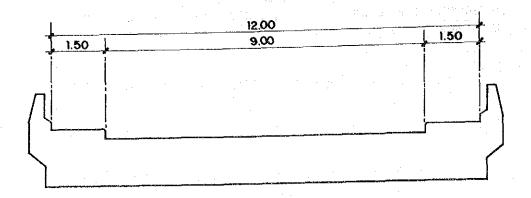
TYPICAL CROSS-SECTION OF BRIDGES
